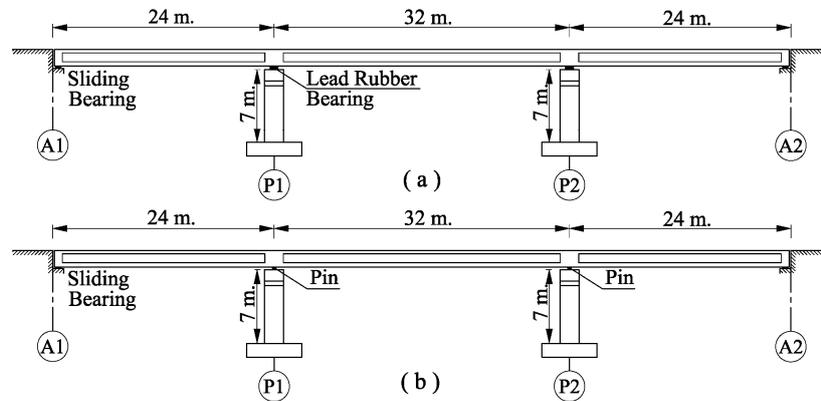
Longitudinal view of bridge; a) the bridge with seismic isolator; b) the bridge without seismic isolator
